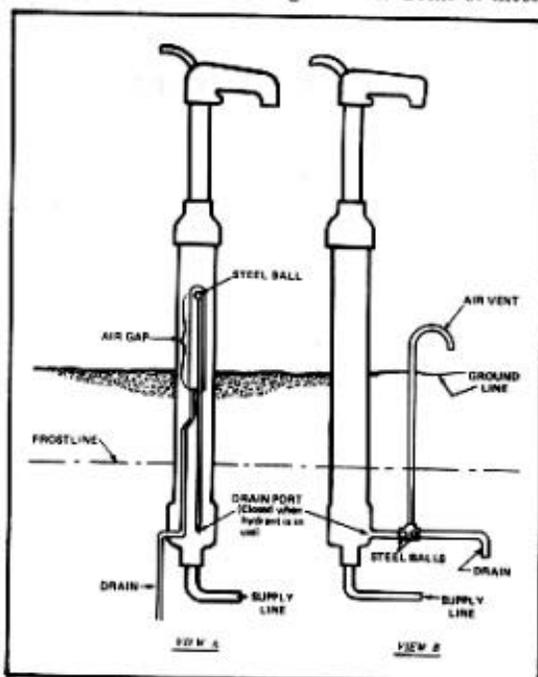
Hydrant that drains water in the barrel into the surrounding soil. (Clayton-Mark, View A; Modern Kelly, View B).
